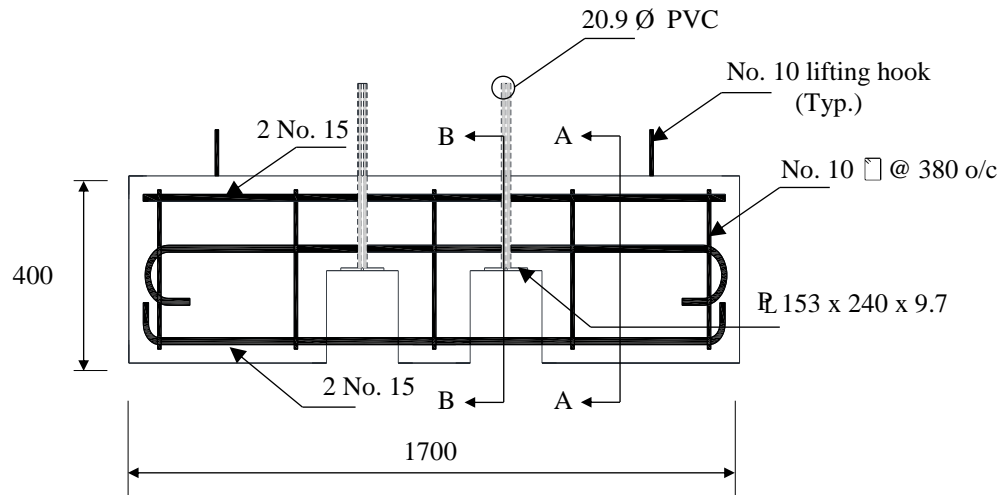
Typical concrete grade beam for UB walls (dimensions in mm).
